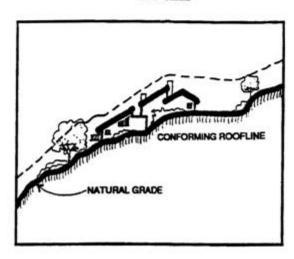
BUILDING HEIGHT/ROOF SLOPE
